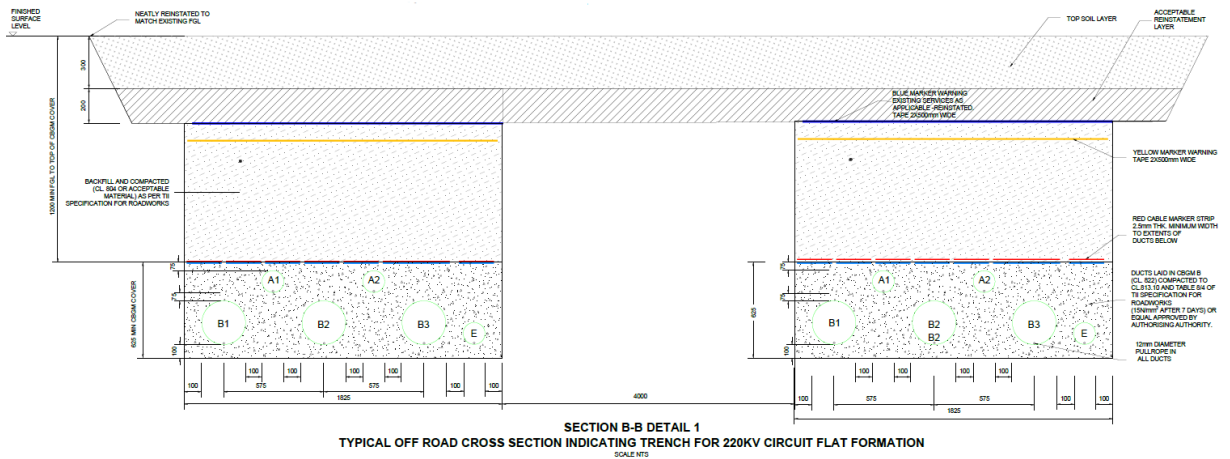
Indicative Trench Cross Section – Flat Arrangement
